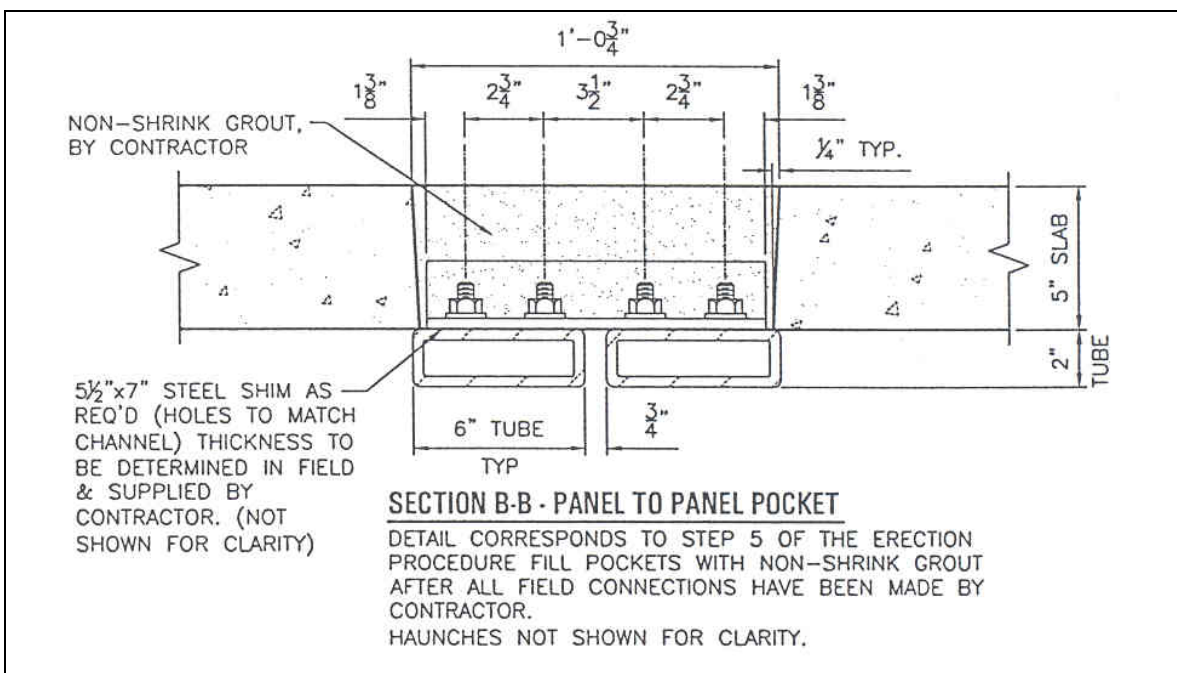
Panel to panel connection section for bridge over Little River Town, Stowe, VT (The Fort Miller Co., Inc., 2000)
